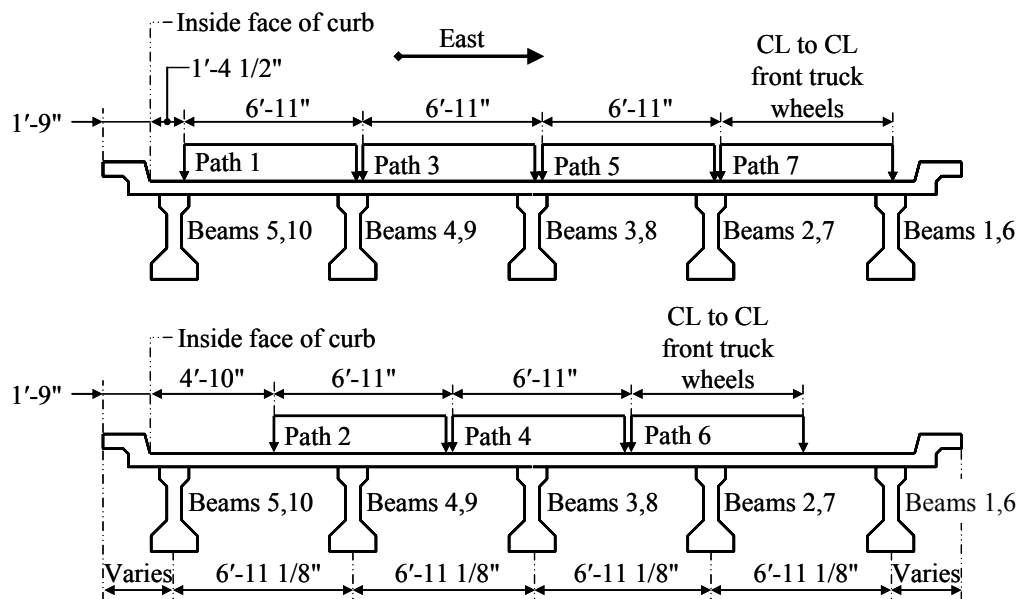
Load Paths for Wimberley Bridge Load Tests
